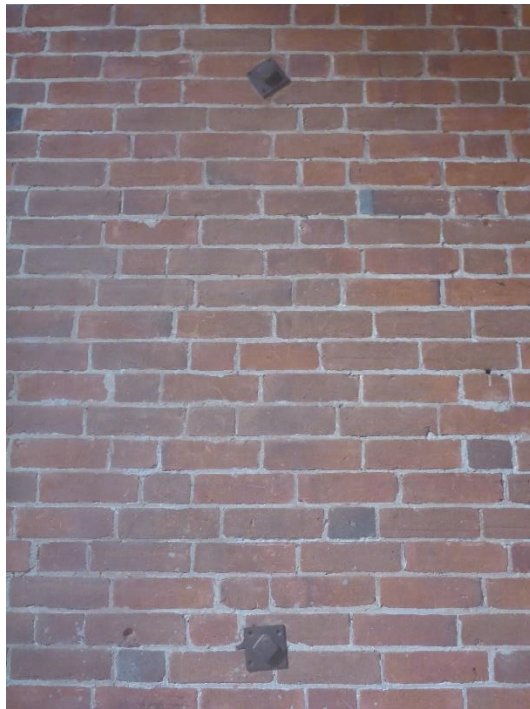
A more detailed view of the Flemish bond face brickwork in the original side boundary walls and visible within the rear warehouse / carparking structure. (Source: VAULT)
